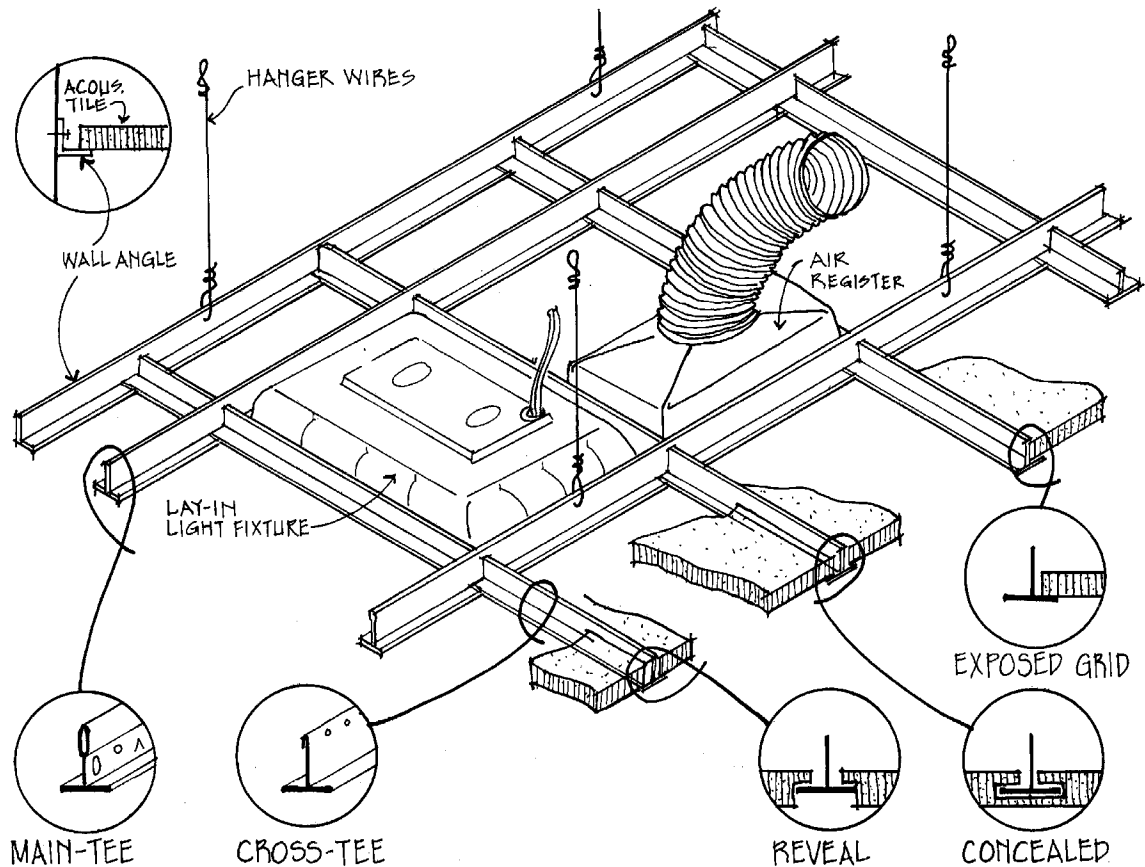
A ceiling assembly is composed of metal runners suspended by wire from the building structure above. Light fixtures and ceiling panels lie within this gridwork.
